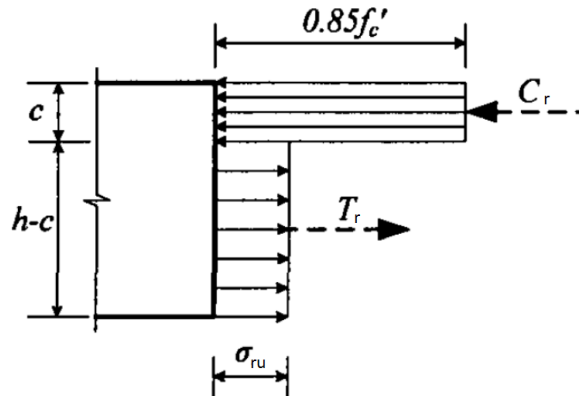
Stress Blocks at the Cracked Section (Adapted from Dinh (2009))
